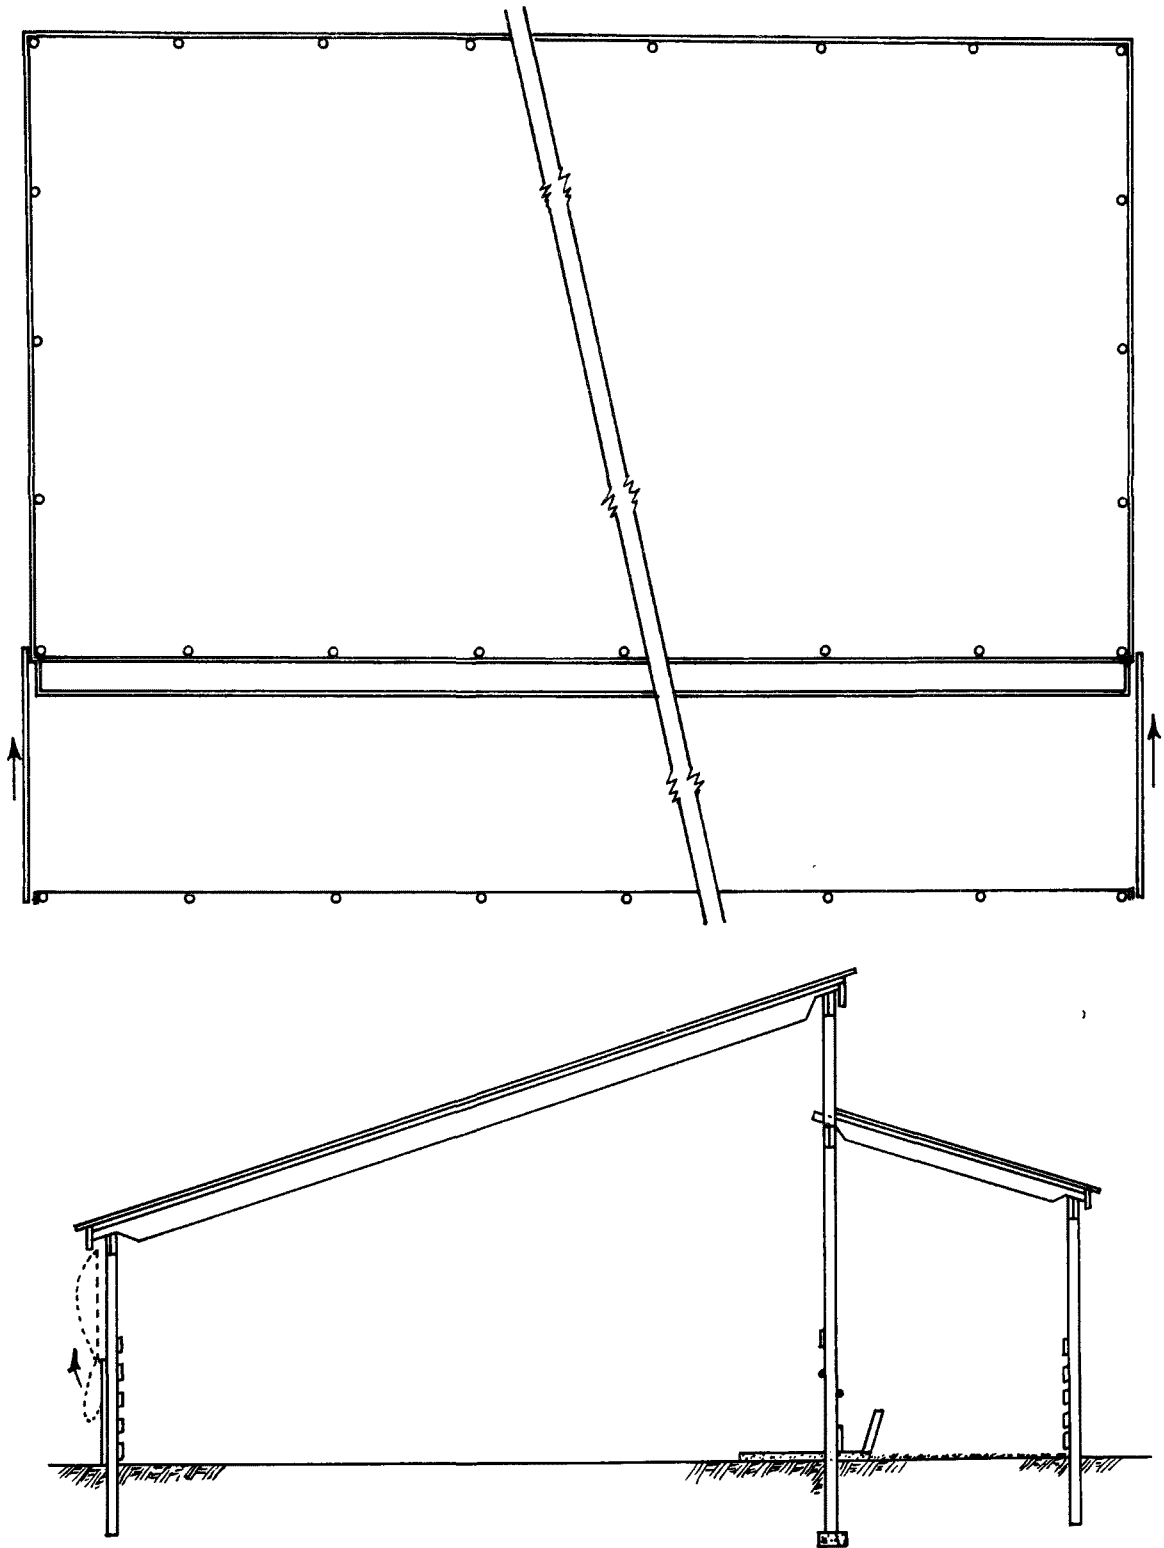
Cold confinement building with dirt floor and canvas side curtains
